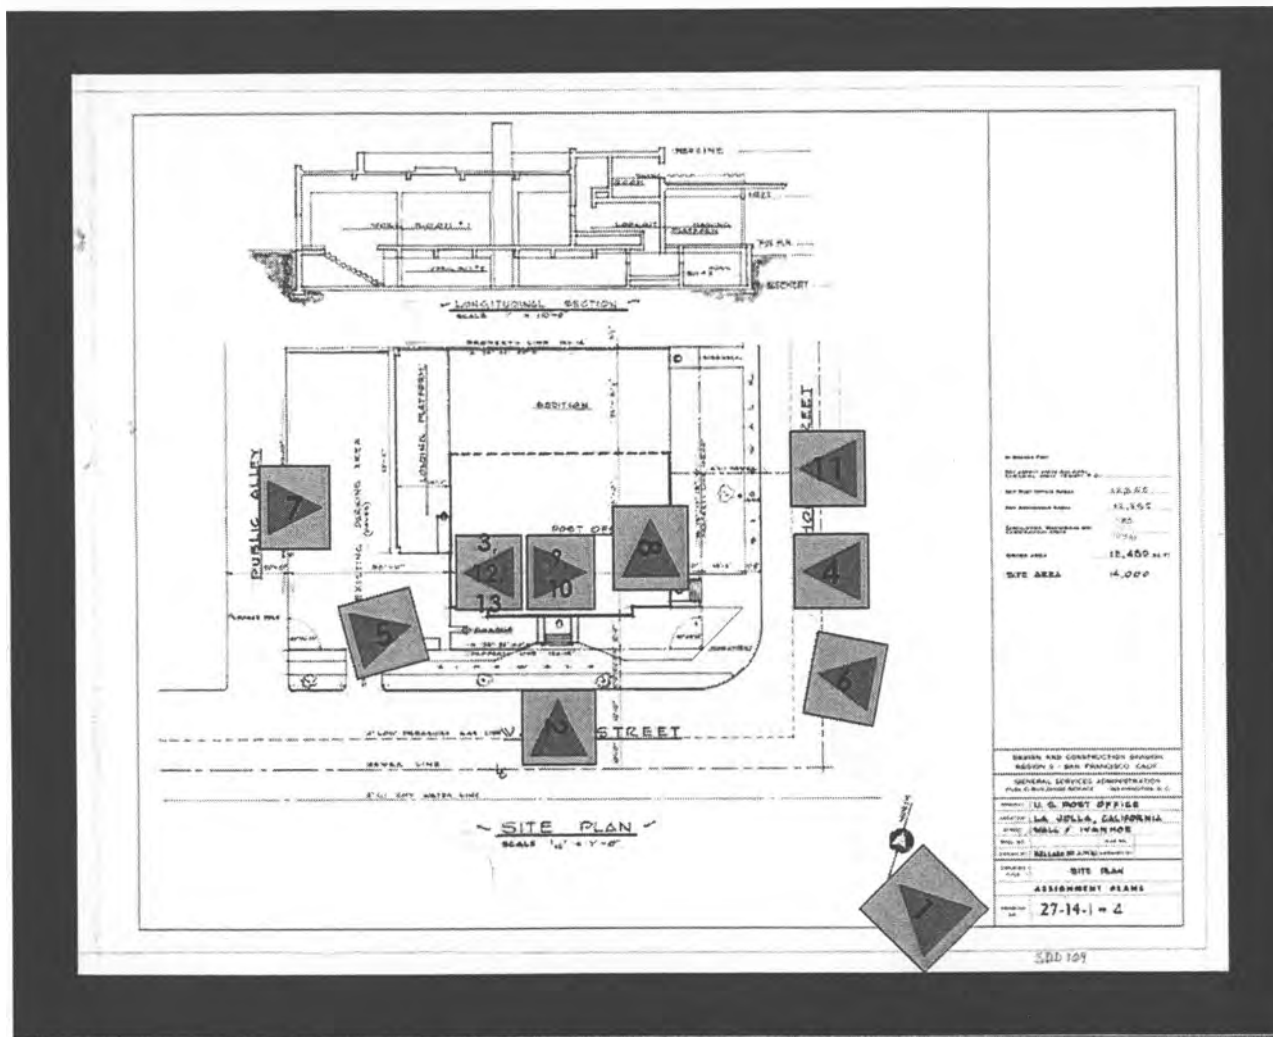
La Jolla Post Office Site Plan & Photo Key.
